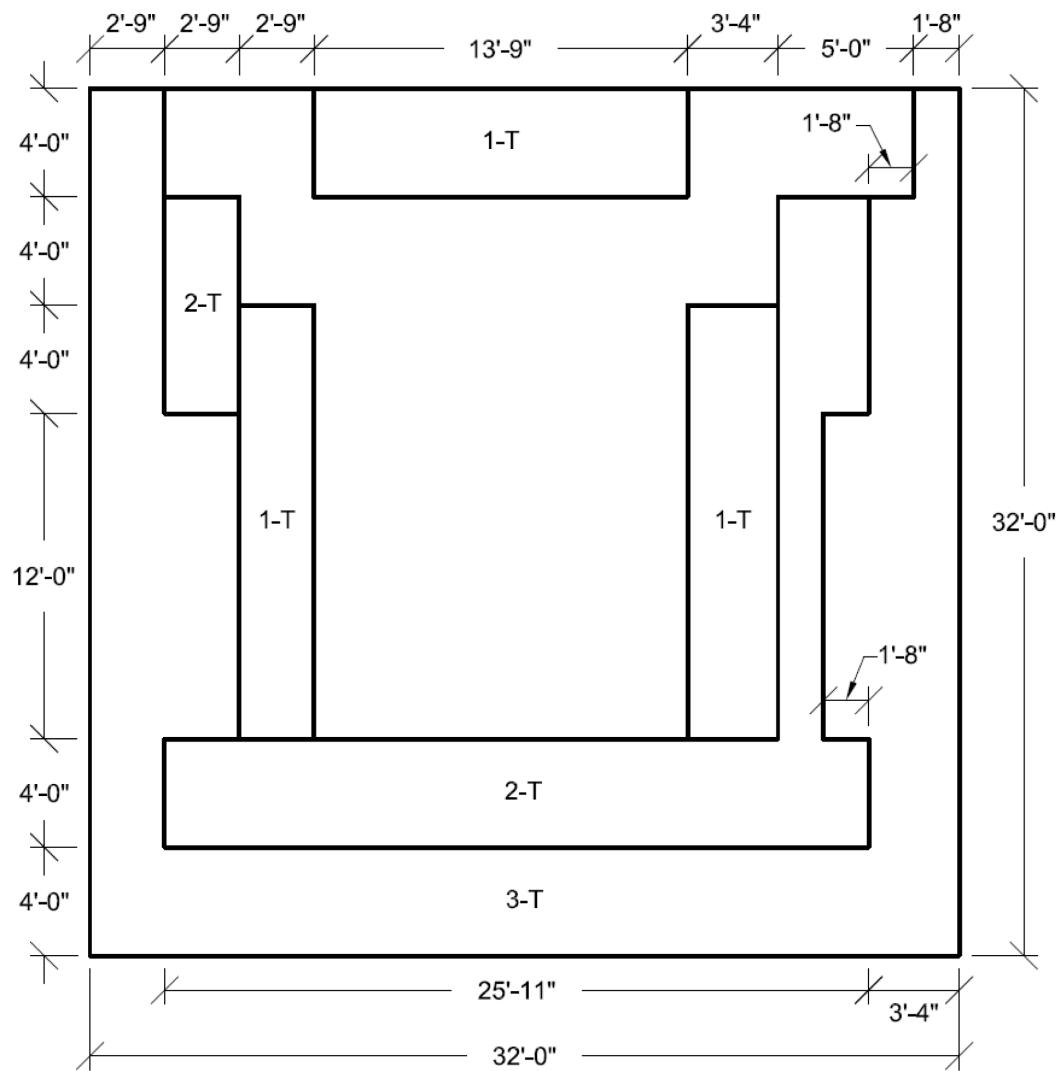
H.6-189 DGFOSV Wall 12 Looking From Outside Transverse Reinforcement Zones
